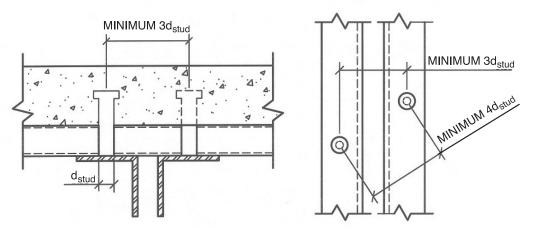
MINIMUM TRANSVERSE SHEAR STUD SPACING
